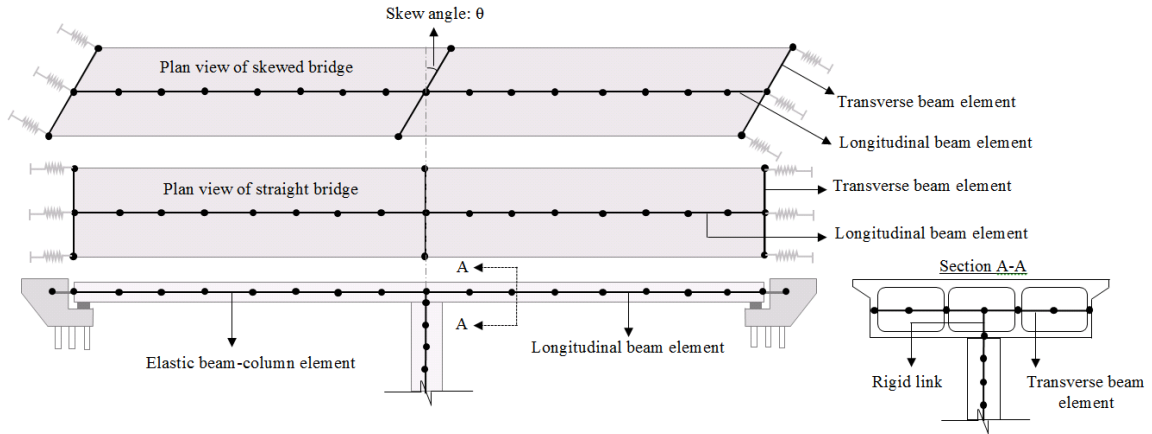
Illustration of box-girder bridge deck, the orientation of transverse deck elements in straight bridges versus skewed bridges, and the cross-sectional view of the bridge deck
